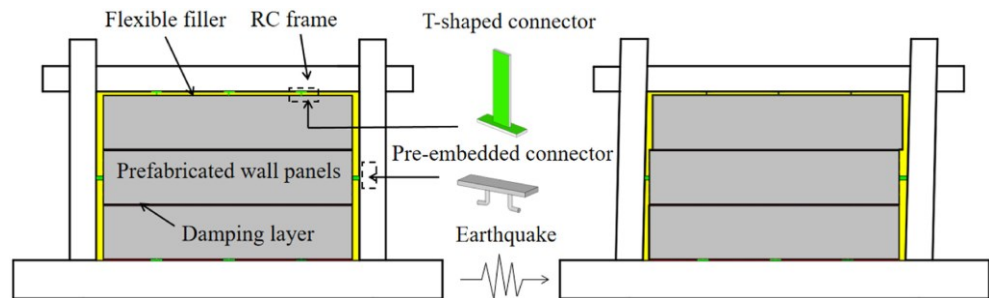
Hybrid solution with prefabricated damping wall panels with sliding joints proposed by Zhang et al. (2023) [23].
